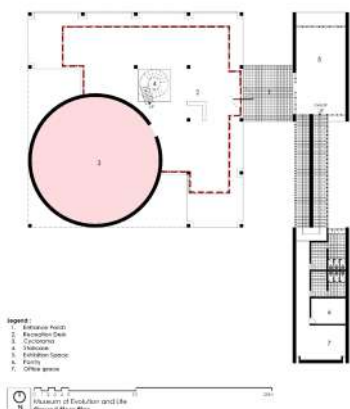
a: Ground Floor Plan of the Museum showing the open façade
